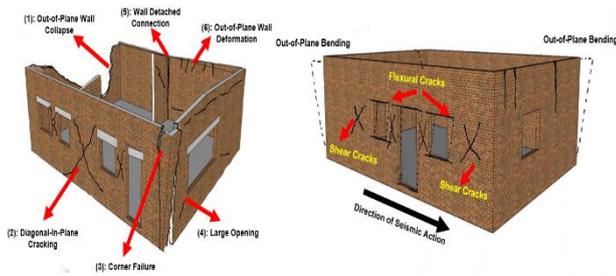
Common failure mechanism for adobe masonry structures.
